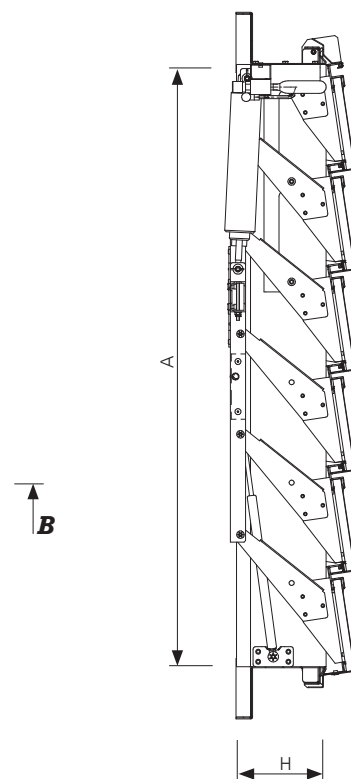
Section A-A of mcr LAM louvered vent in closed position (façade installation)
